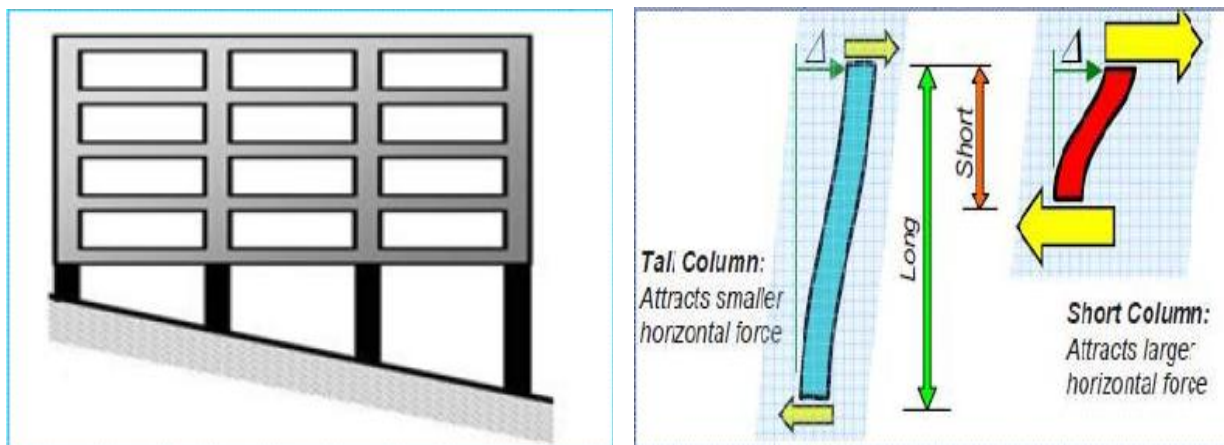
Building frame with Short column Fig. 2.2 Structural behavior of short column under lateral load
